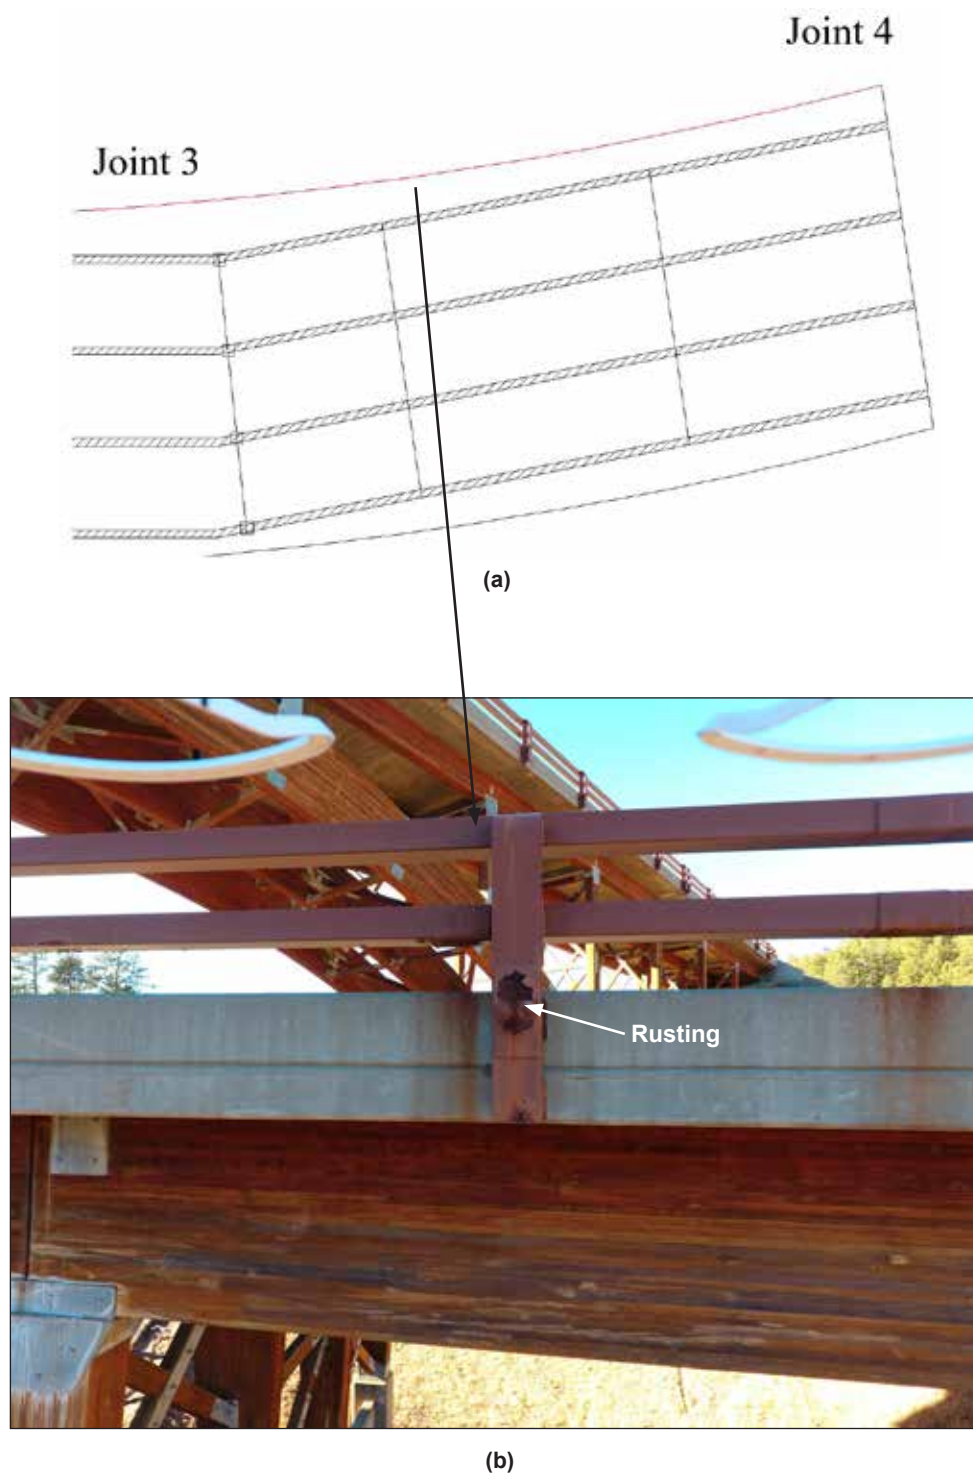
Sample damage on railing: (a) damage location; (b) rusting between Joints 3 and 4 near Girder 4.
